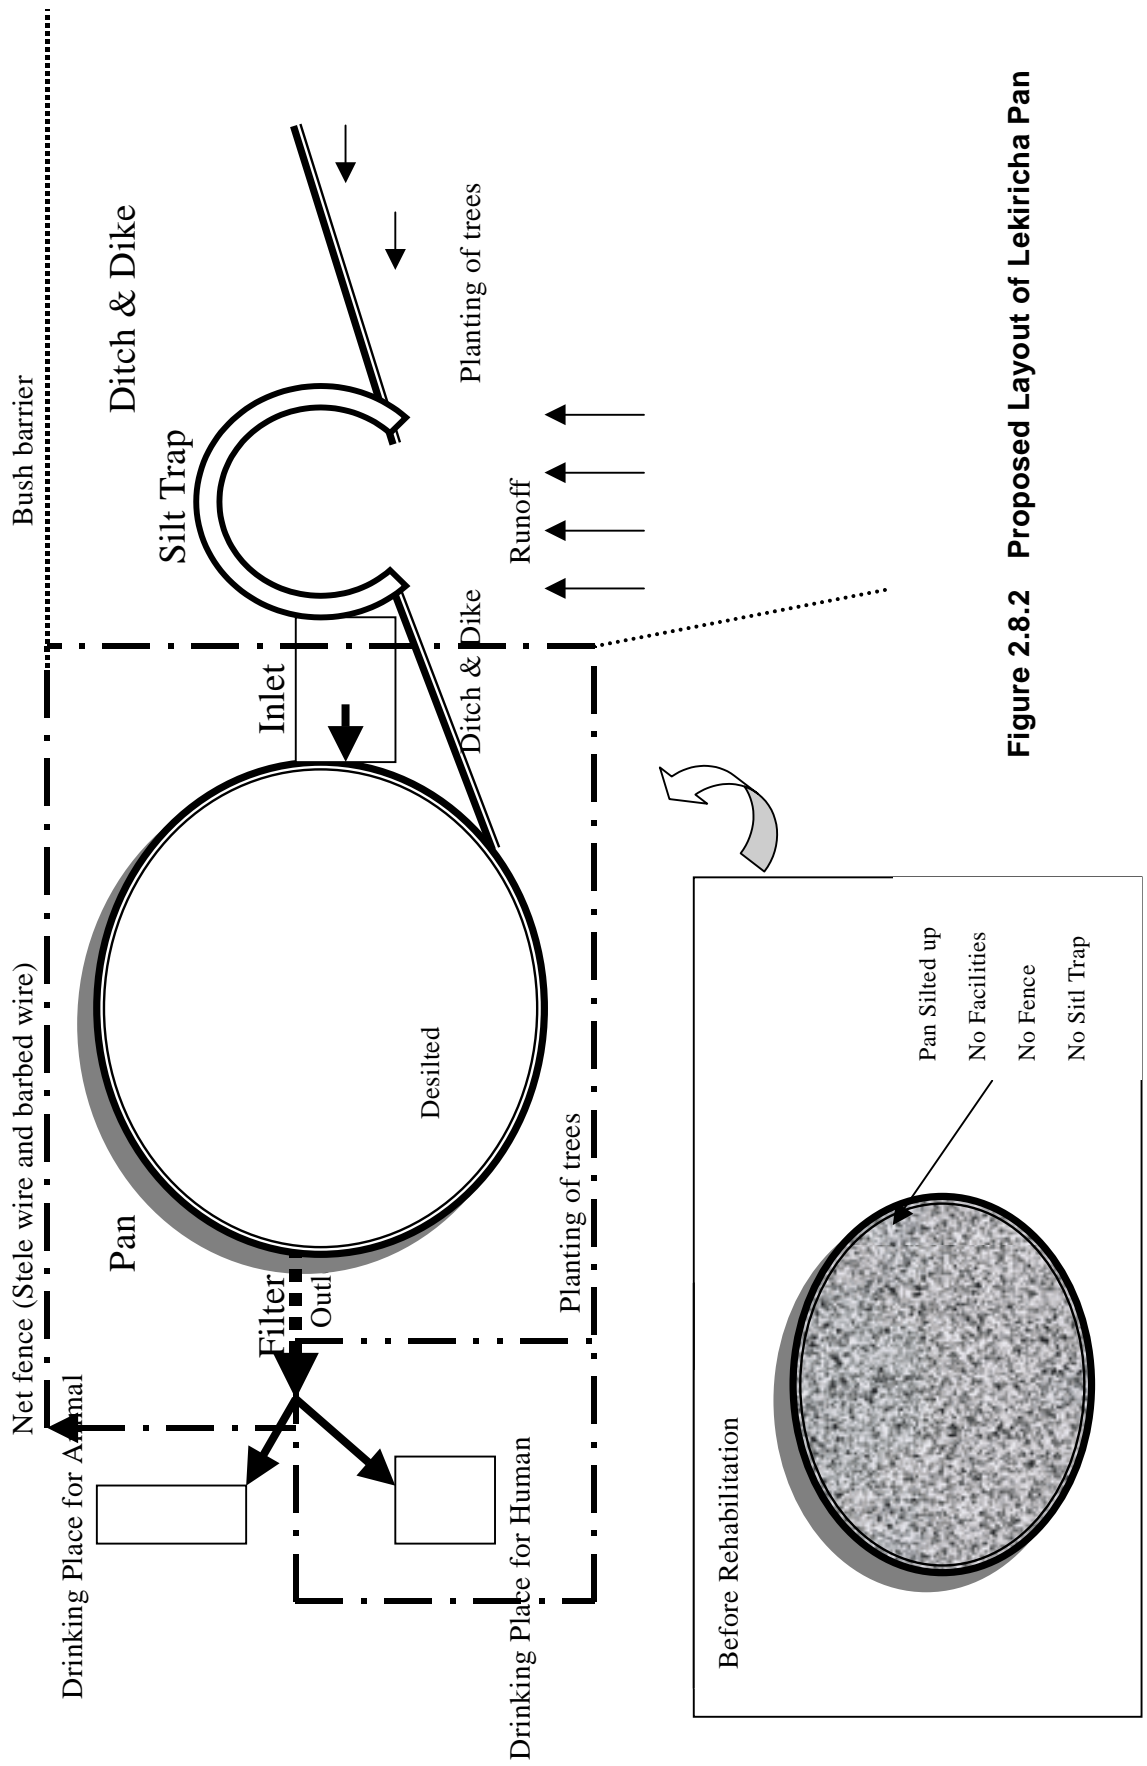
Proposed Layout of Lekiricha Pan
